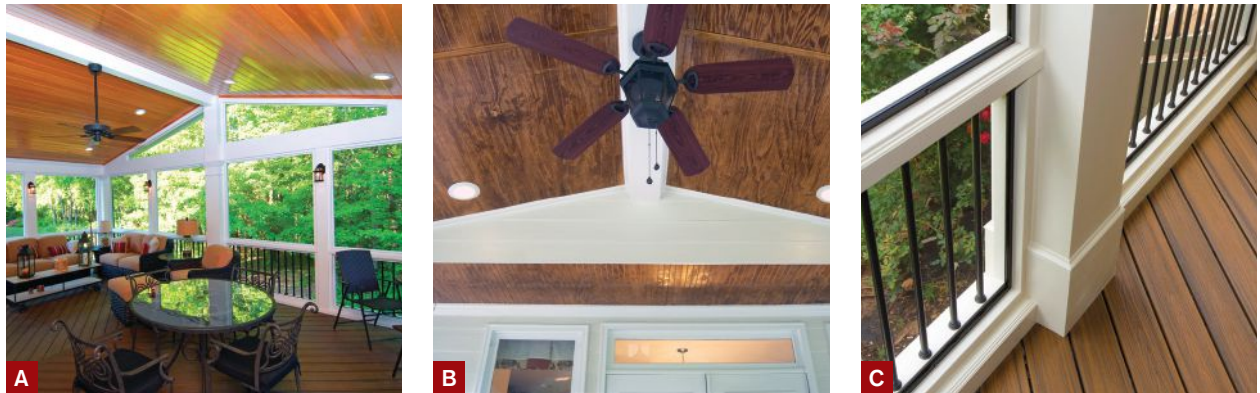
When planning ceiling finishes, keep in mind how light fixtures and ceiling fans may affect the design (A). It may be necessary to incorporate structural features of the existing house, such as this second-floor cantilever, into the porch ceiling (B). Shown here is the author's standard sill plate, chair rail, and column detail, all executed with PVC trim (C).
